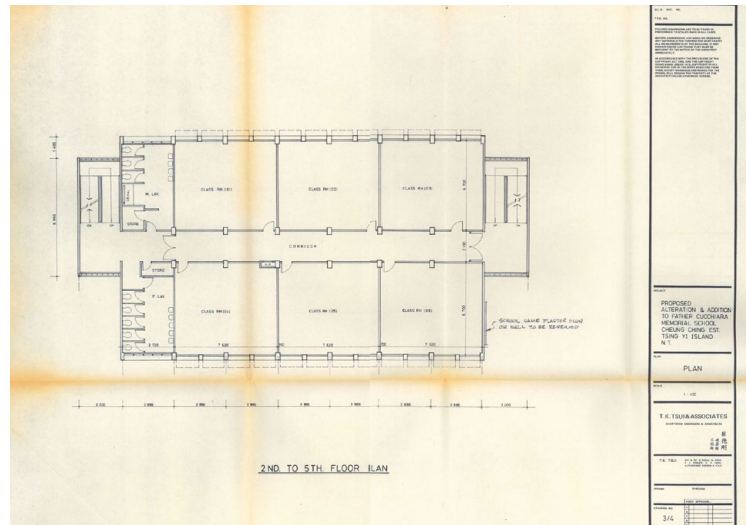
Typical Matchbox School 2nd-5th floor plan.
